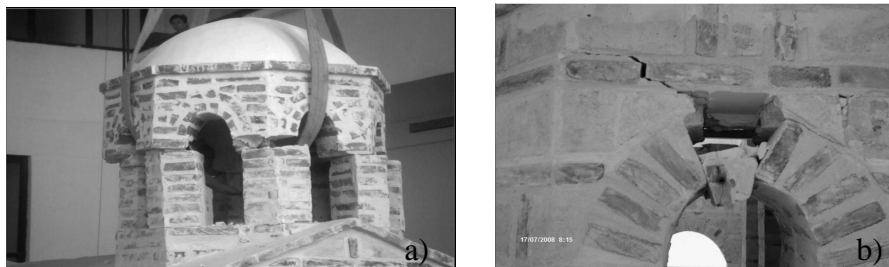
Collapse of the tambour (0.45g) (a) and damages to wall and openings (0.70 g) (b)
